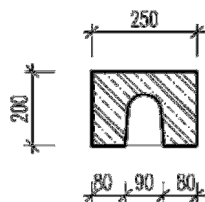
Cross section of subtle HPC column Fig. 2 Floor panel from HPC and lightening fillers
